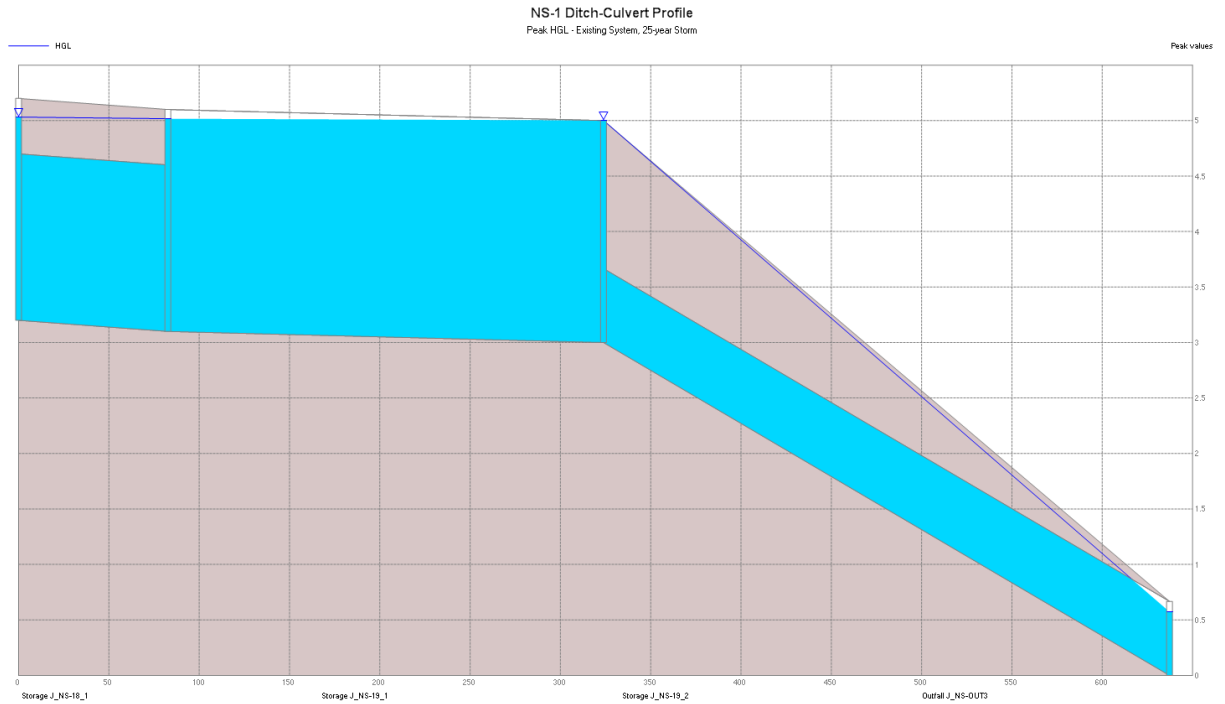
NS-1 Ditch & Culvert System Profile – Existing Conditions
